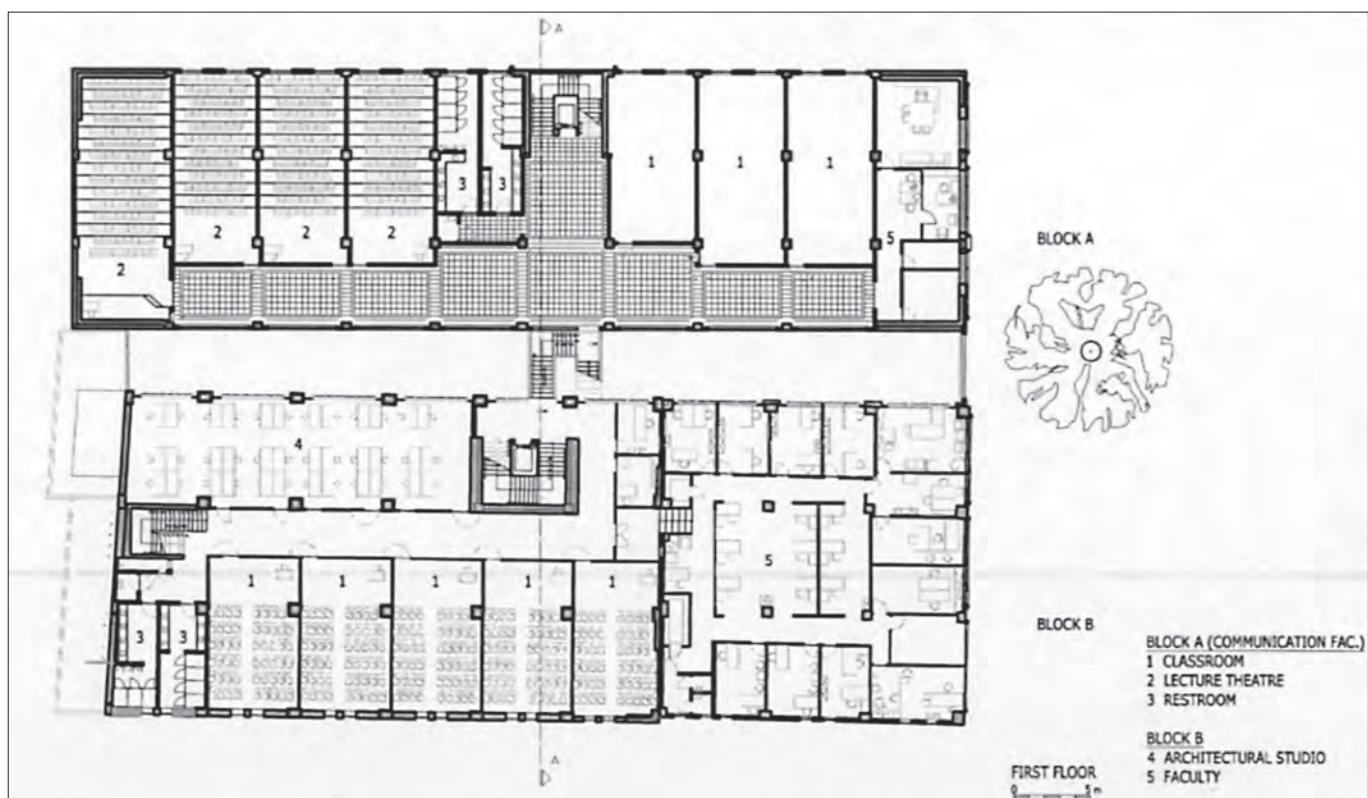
BU Campus, first floor plan of the two buildings after their integration into a unified complex.
